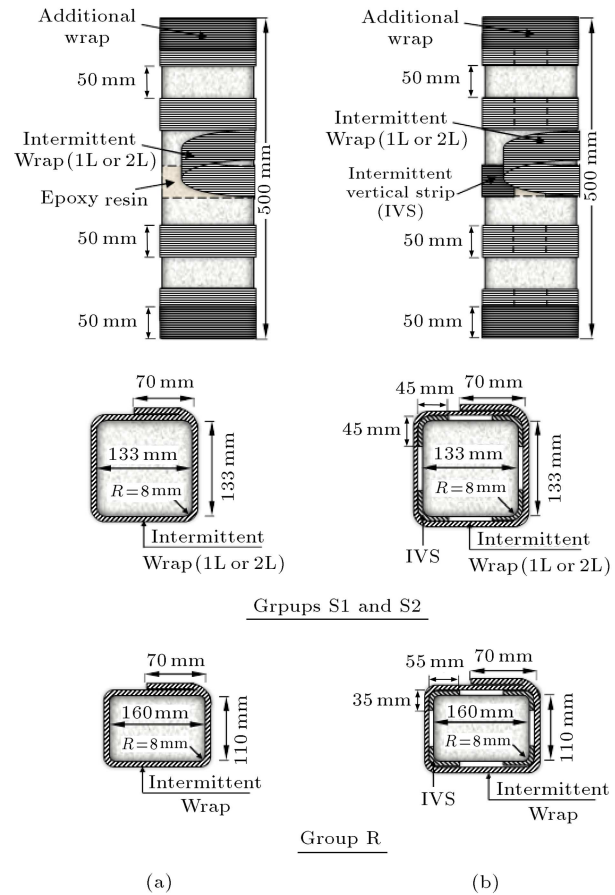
Strengthening details of the specimens: (a) Intermittent wrap (IW); and (b) intermittent corner strip-wrap (IVS-IW).
